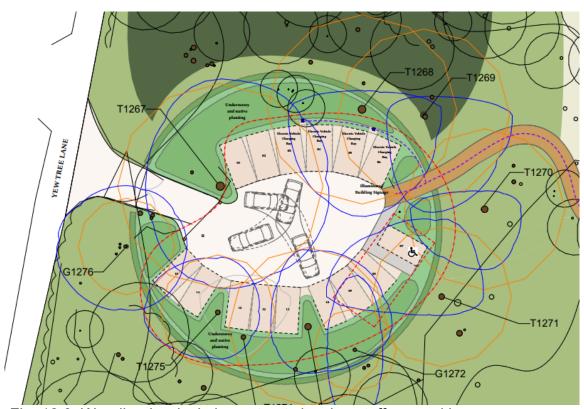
Woodland arrival plan extract showing staff car parking area
